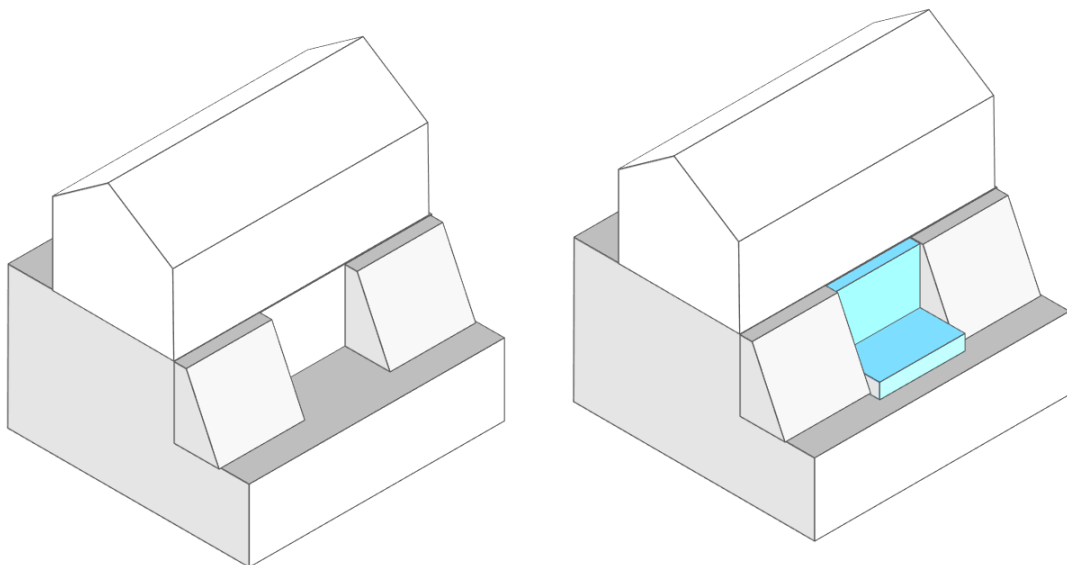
A schematic view of the berm-supported excavation used to facilitate a wall construction near an adjacent building
